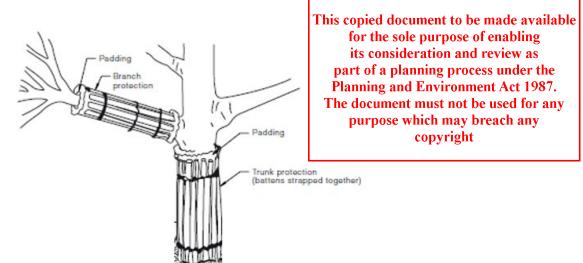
Example of trunk and branch protection (Source: AS 4970-2009).
